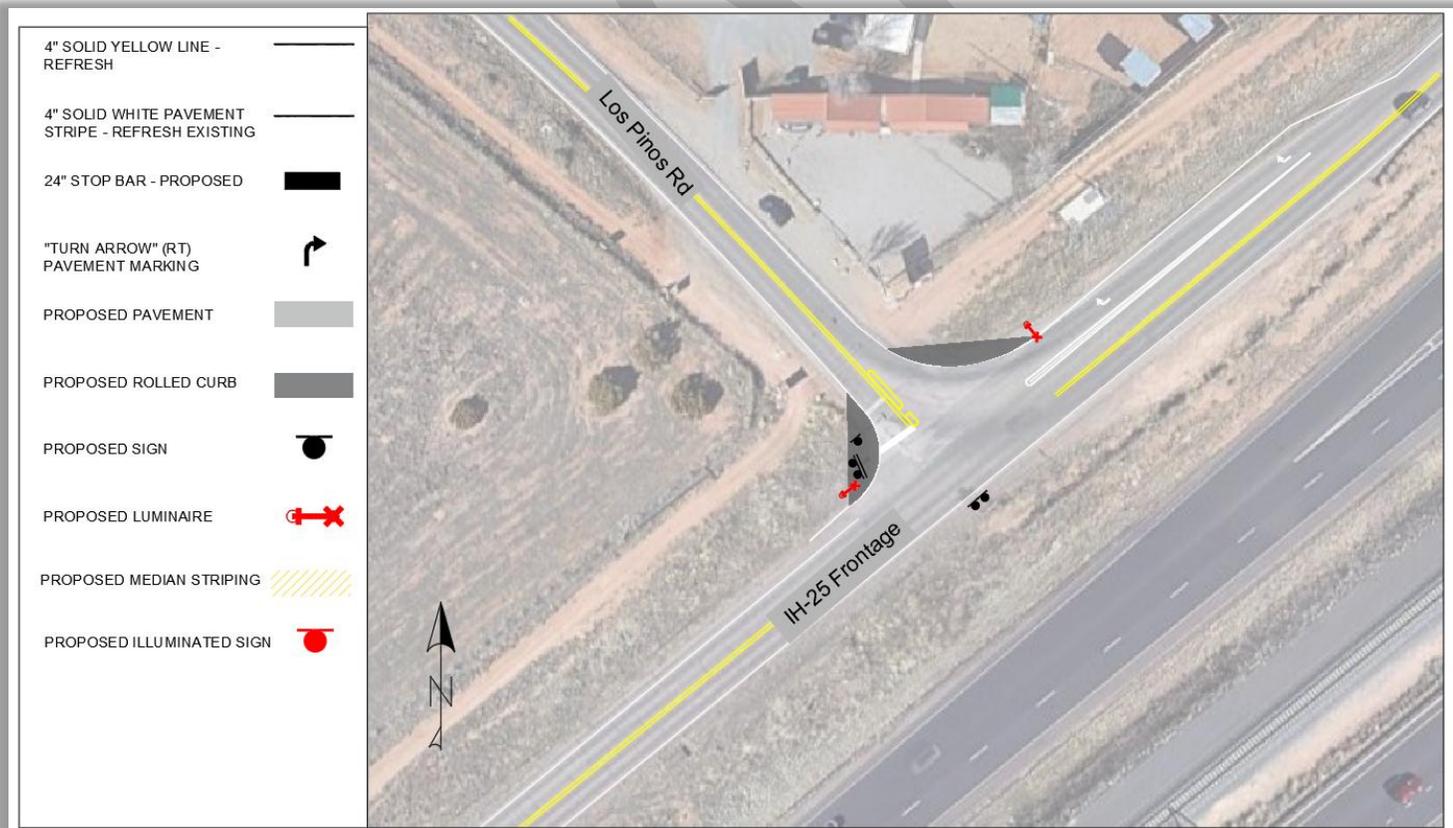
Conceptual Layout with proposed Luminaire locations (Los Pinos Road & I-25 Frontage Road)
